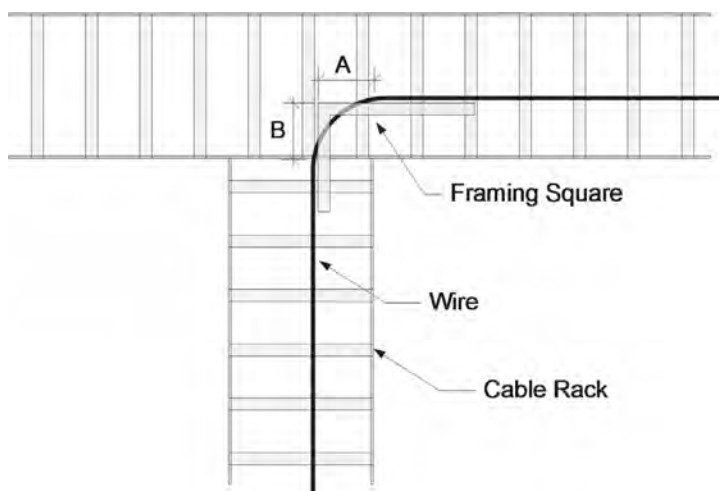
Measuring wire bend radius with a carpenter's framing square. Place the square on the inside edge of the bend as shown and measure lengths A and B from the outside corner of the square to where the cable intersects the straight edge.
